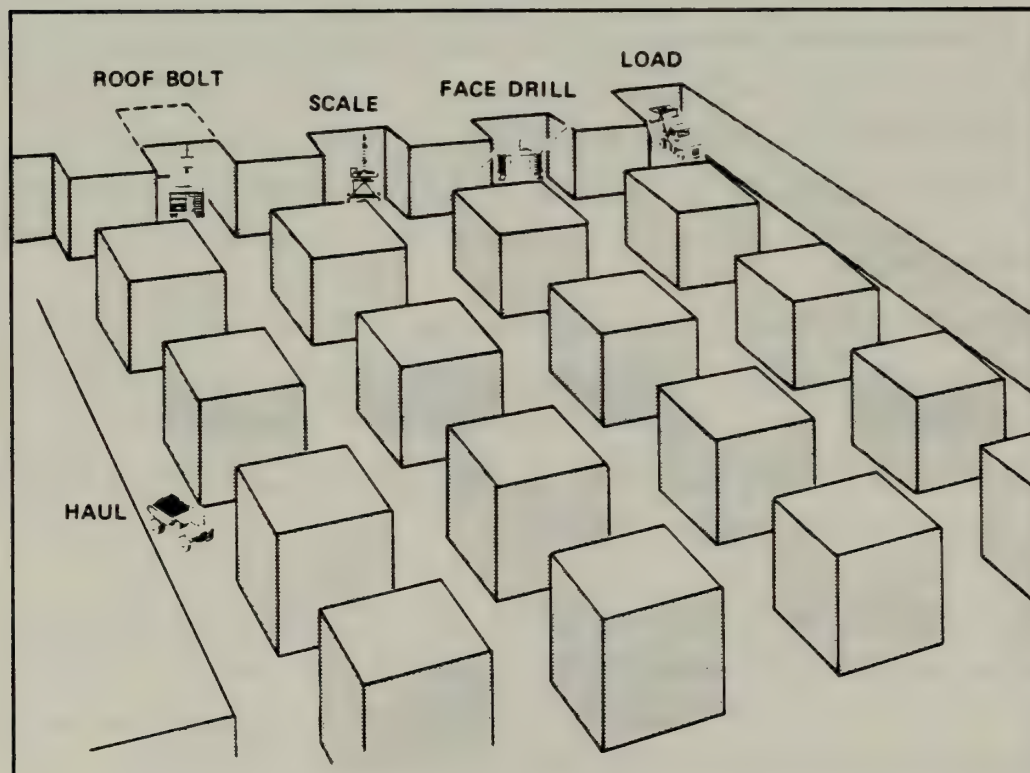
SINGLE-PASS ROOM-AND-PILLAR MINING
